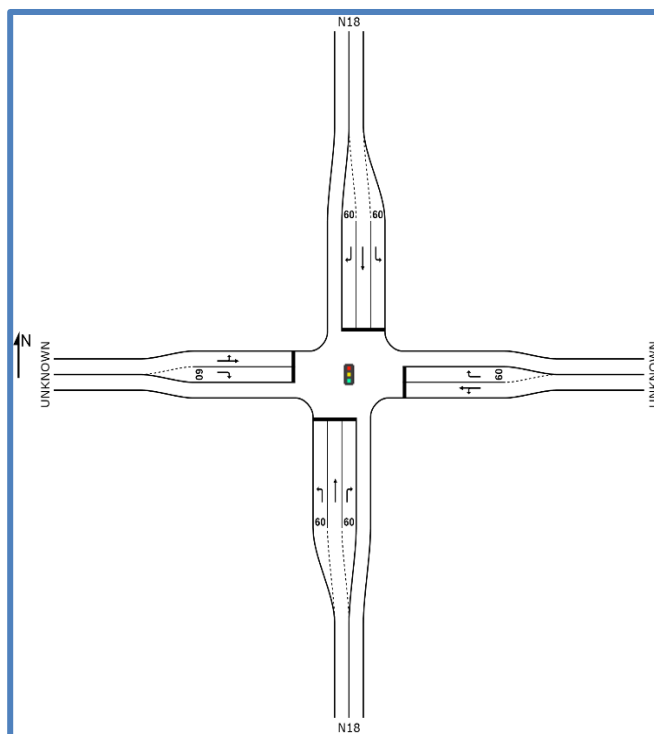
Proposed Layout of N18 and Suid Street Intersection
